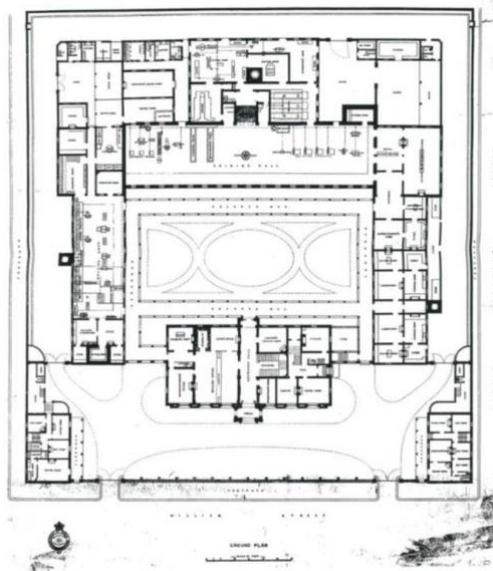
1870 J. J. Clark Architectural Plan - Public Works Department Archives.
